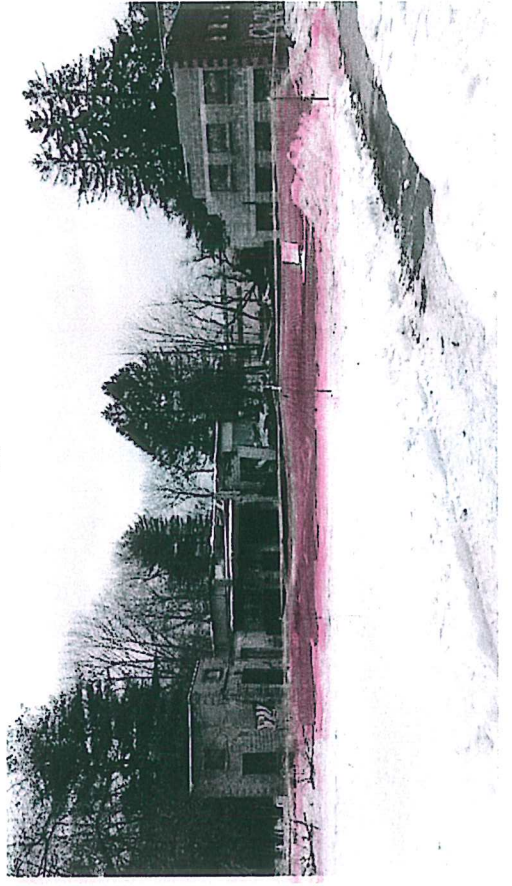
View of existing work area from road side, with portion of front wall remaining.
